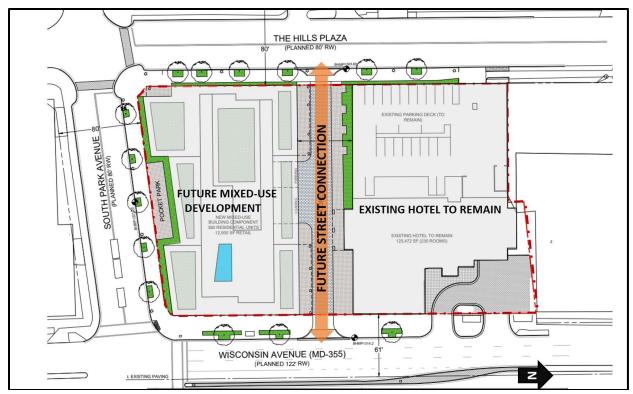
Proposed Sketch Plan (north arrow adjusted to the right)
